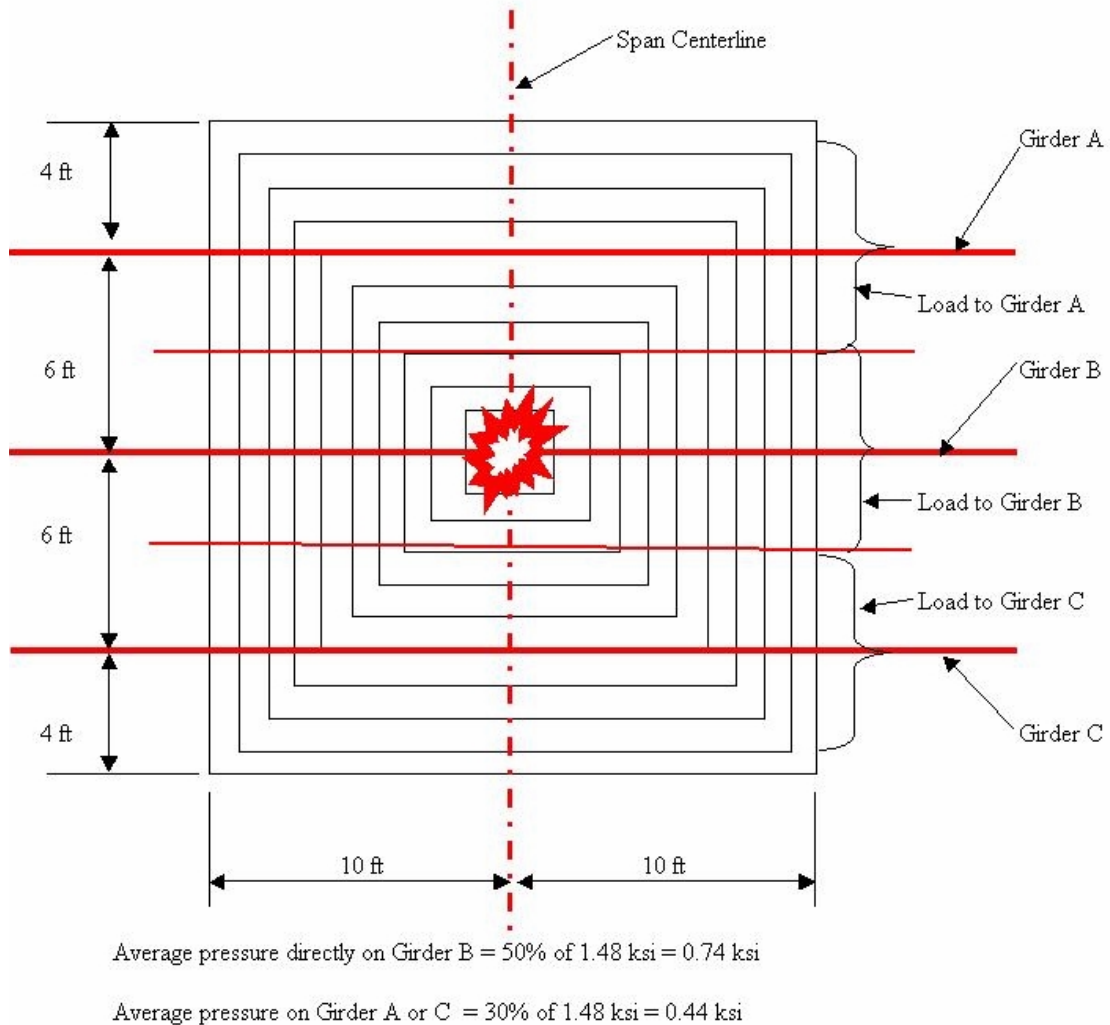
Blast Pressure Distribution on Bridge Deck (Plan).
